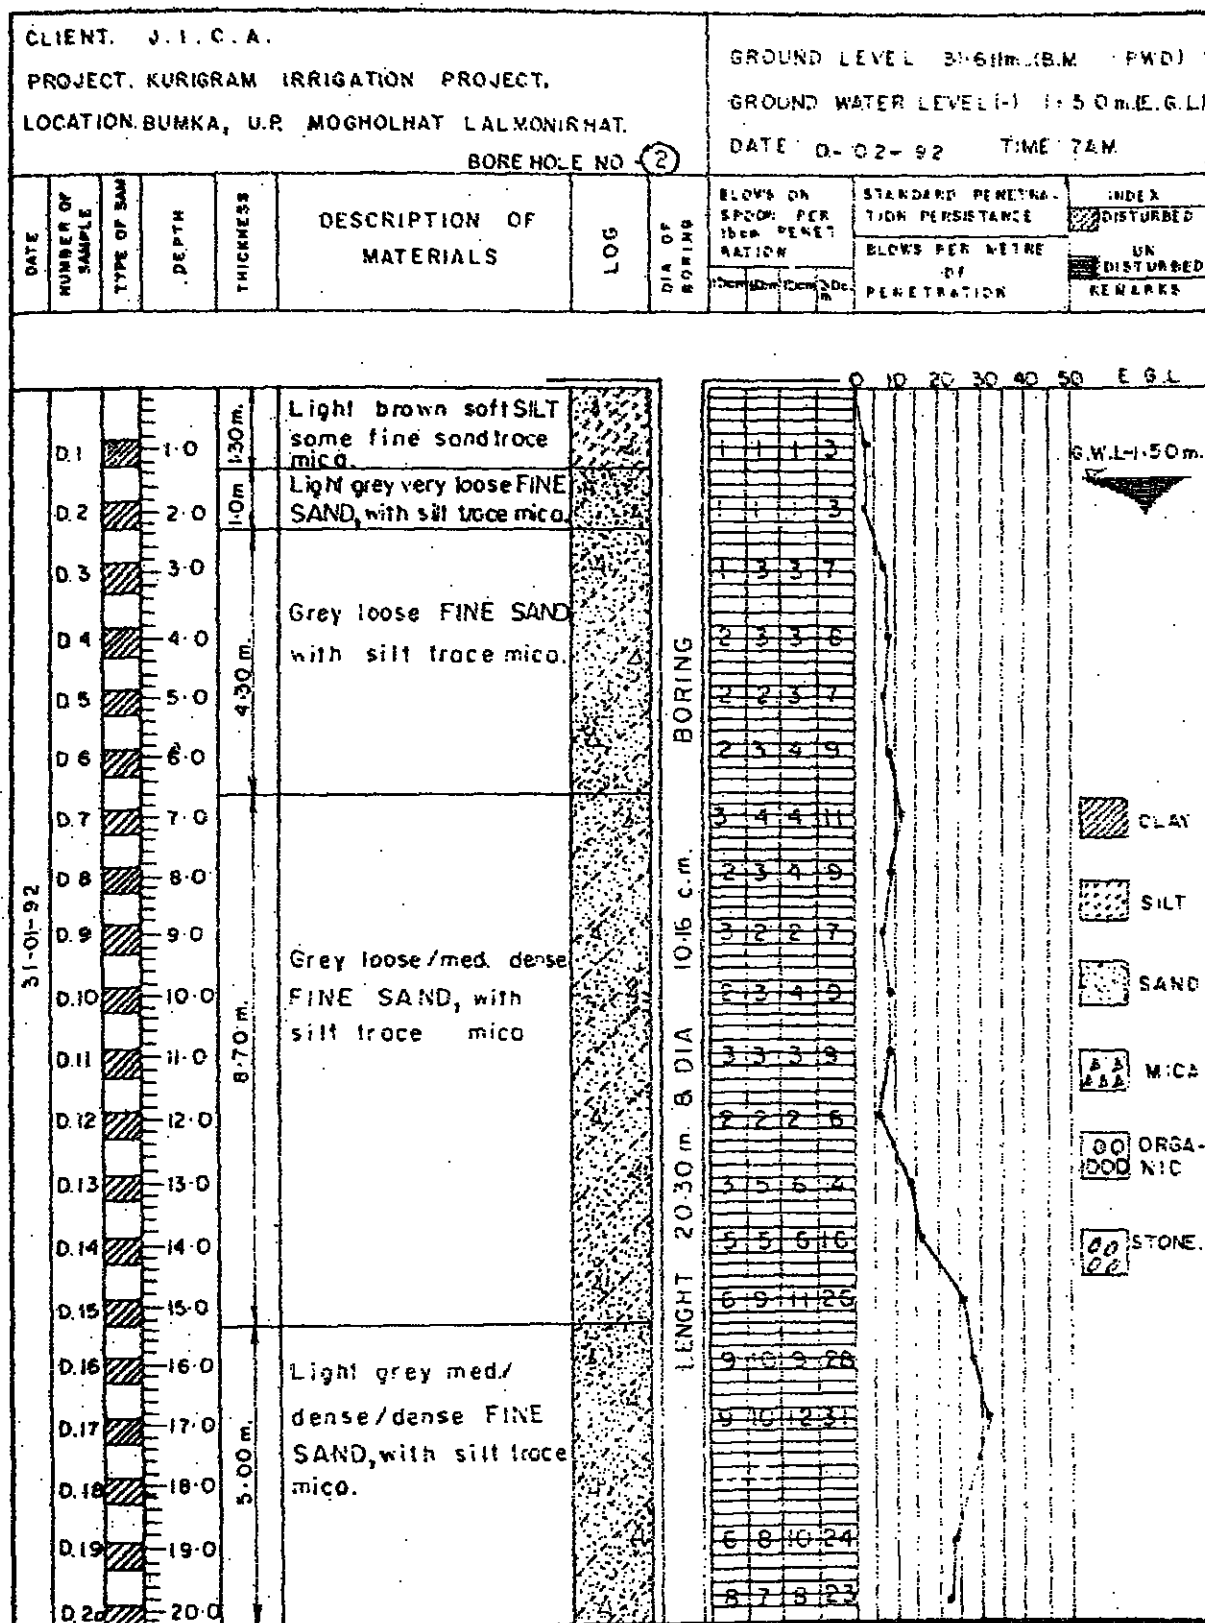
PROPOSED PUMPING STATION SITE (2.8)
